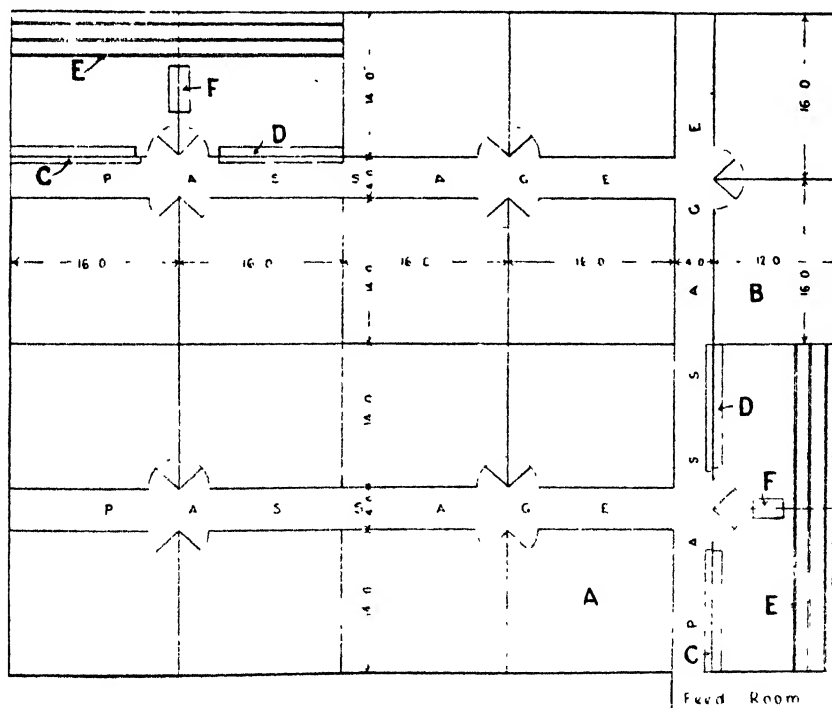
Outline plan of intensive shed. (A) Compartment for 62 layers. (B) Compartment for 52 layers. (C) Water and feed troughs. (D) Nest boxes 24 inches above floor level. (E) Perches. (F) Dry feed hoppers.
